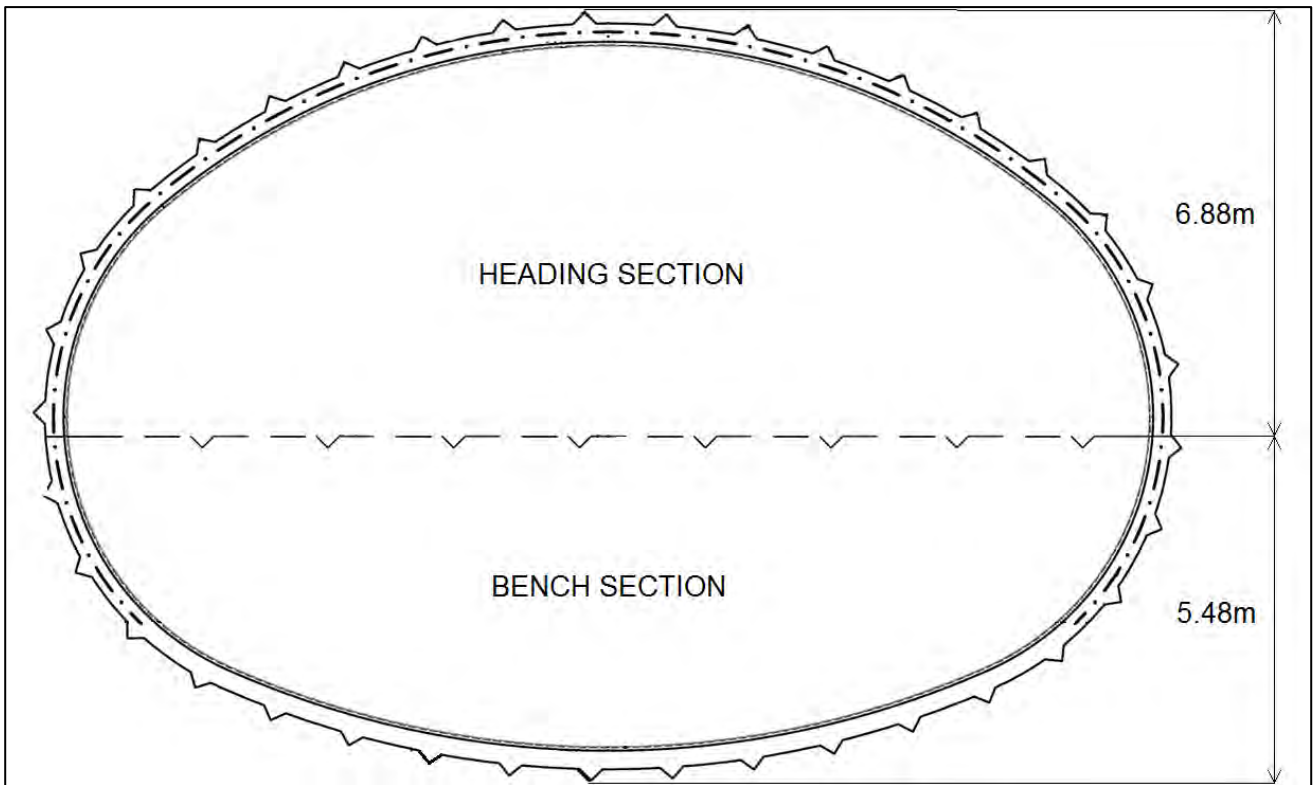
Expected heading and bench sections for the St Helena tunnels
